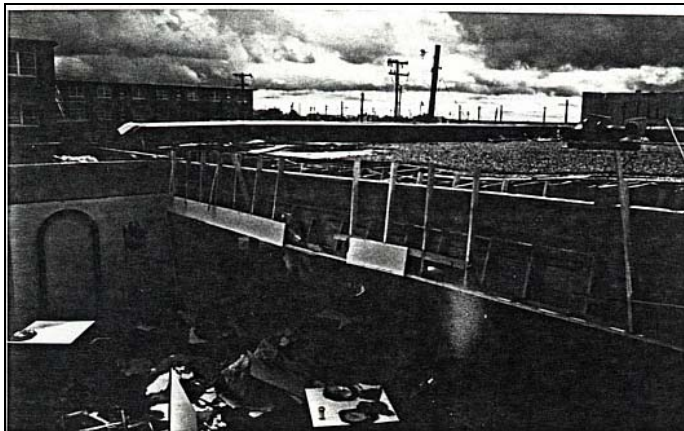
Flat roof section removed from dining hall. Roof was built-up type supported by wooden joists that spanned between steel I-beams and perimeter masonry walls.
